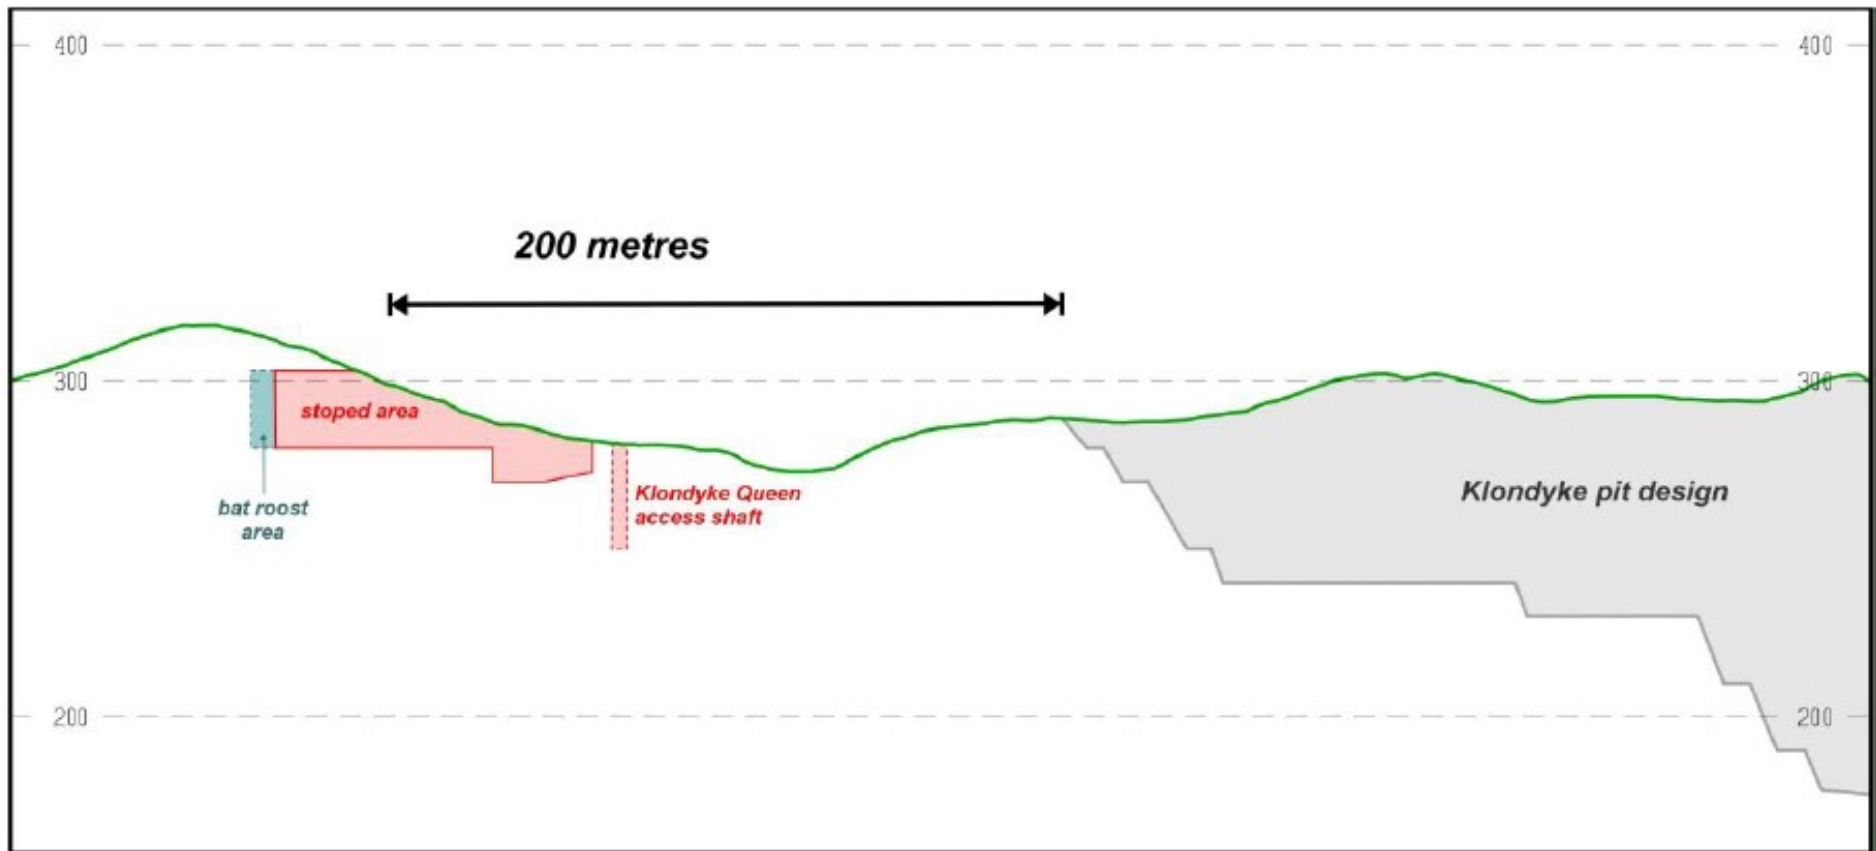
West-east long-section of the proposed Klondyke pit in relation to Klondyke Queen roost site
